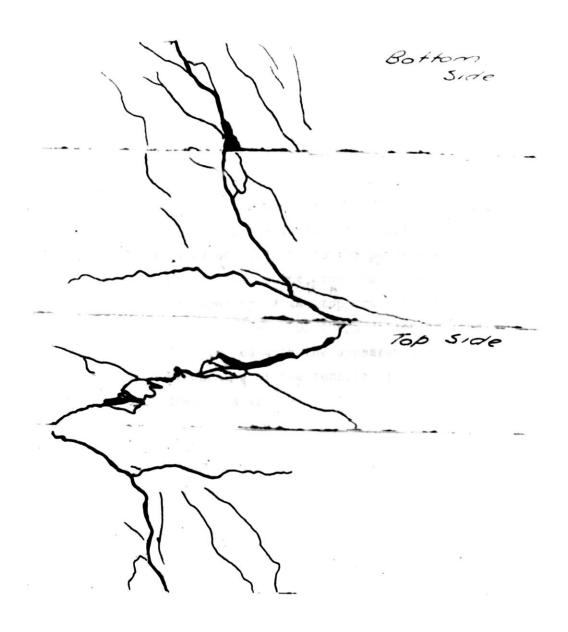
DEVELOPED FAILURE SURFACE BEAM 36T4 MODE 1 FAILURE.
